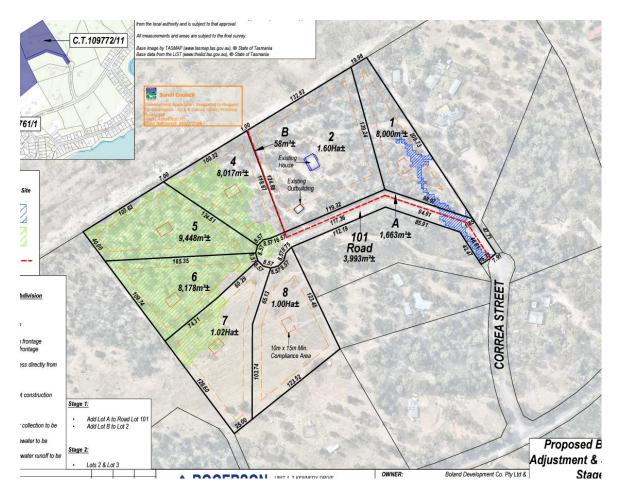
Proposed Subdivision - Stage 1 (Stage 1 comprises a boundary adjustment in order to facilitate an acceptable lot size for Lot 2 to be subsequently subdivided for the creation of Lot 3).
